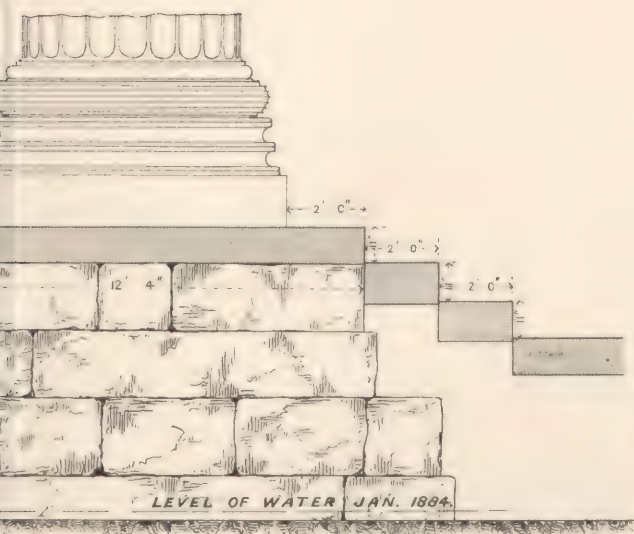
FOUNDATION OF OUTER COLUMN, C. PERISTYLE.
